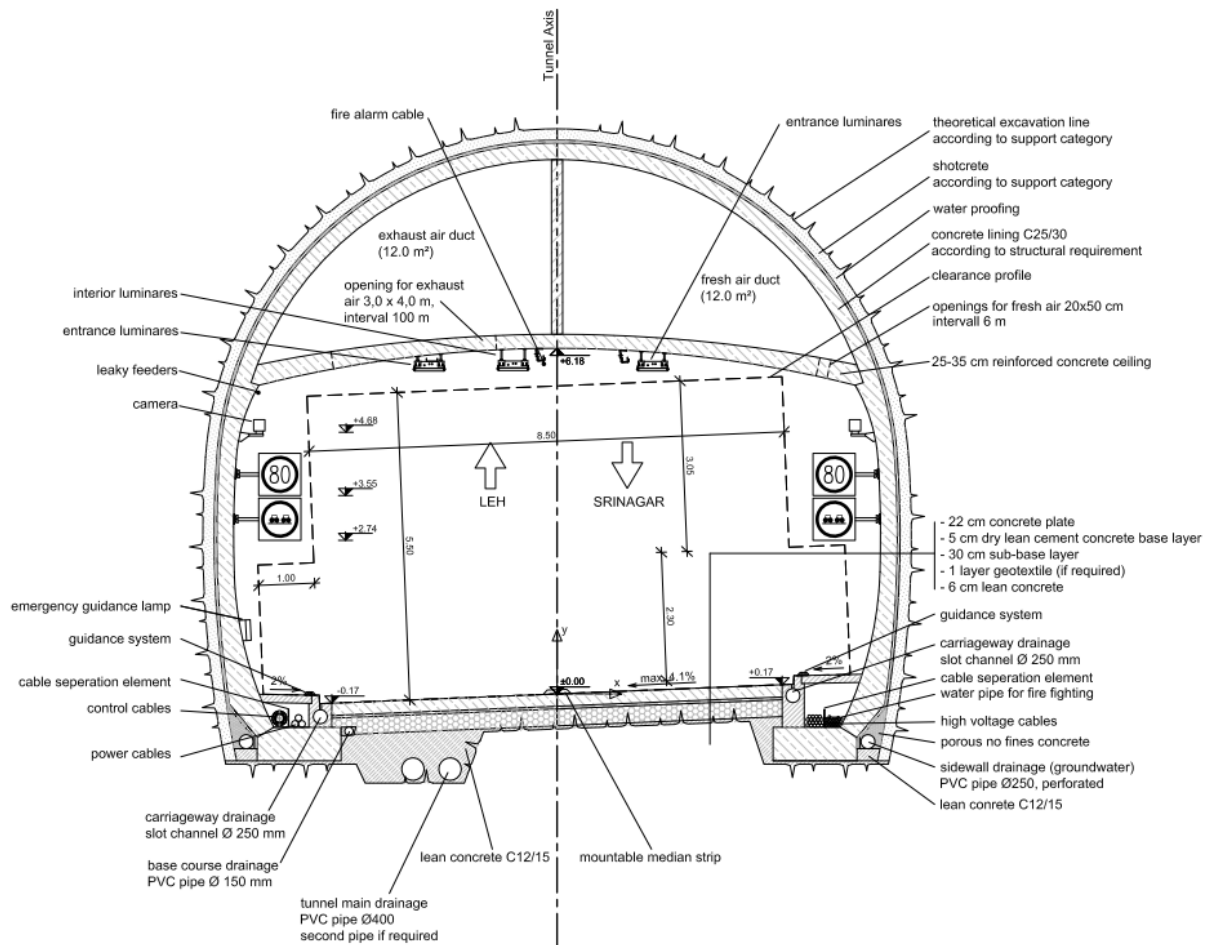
Typical cross section for bi-directional single tube tunnel without invert
